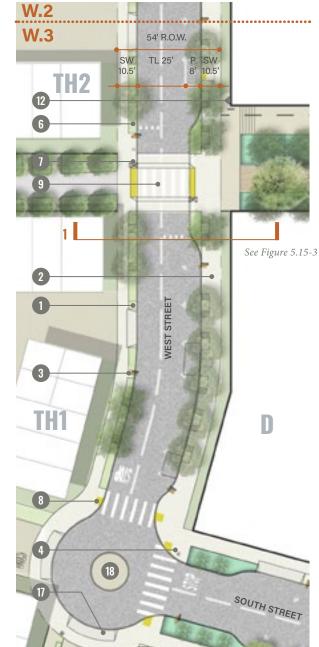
West Street, Site Plan W.2 & W.3
